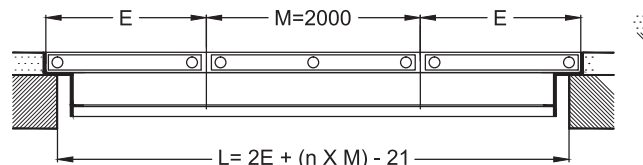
Typical Section of intermediate and end sections for Type 'AF' Linear Grille
